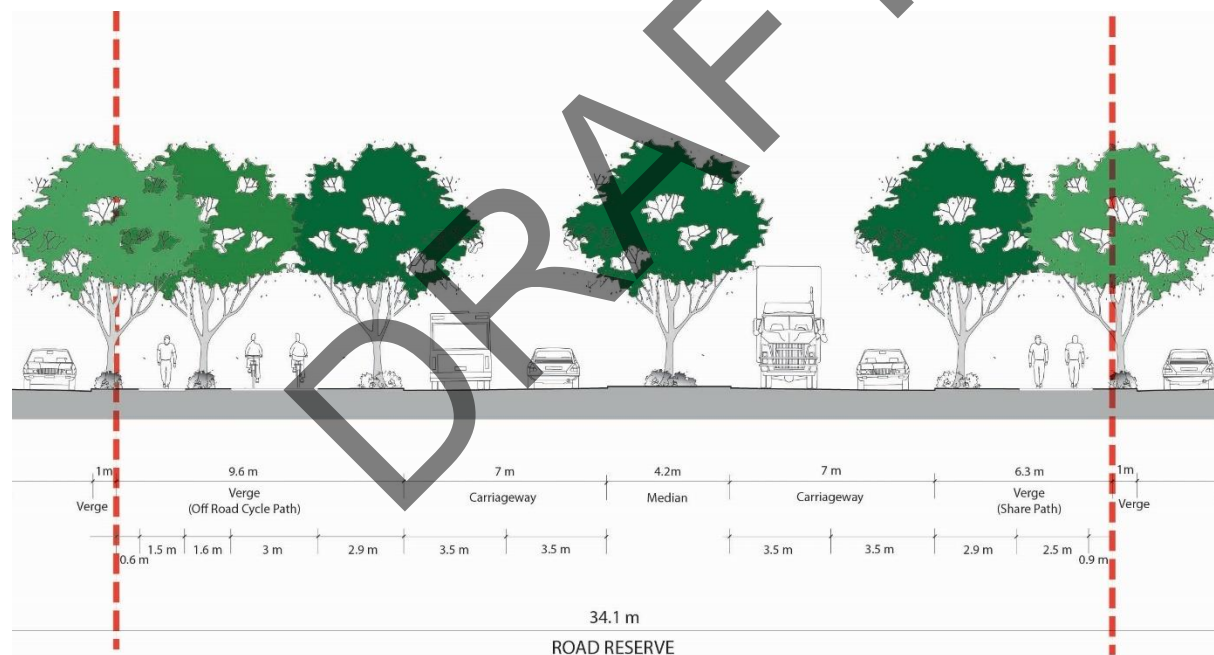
Sub-Arterial Road Cross Section (Off-Road Cycle Lane)
